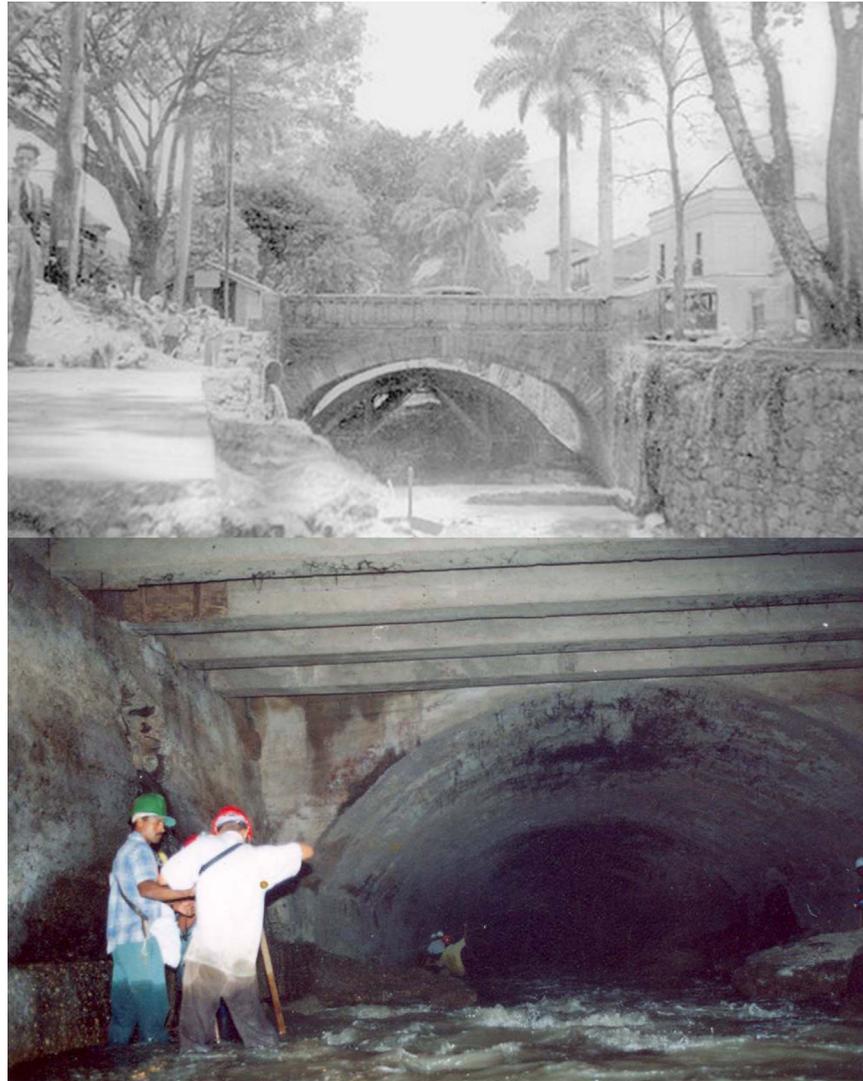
Photo inside the culvert under La Playa Avenue. Notice the existing structure (arch) of the old bridge. Upper bridge over La Playa Avenue 1910. Source: courtesy of Medellín Metropolitan Planning Office.
